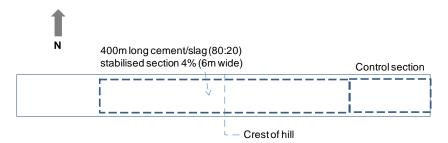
Plan view of stabilised section for Four Corners Road, Jerilderie.
